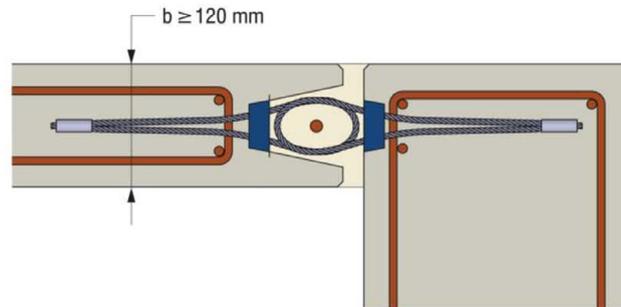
Wall – Wall – Corner connection - Standard detail (flat installation)
